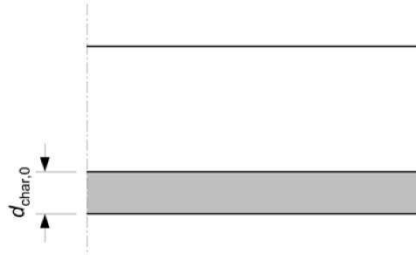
One-dimensional charring of wide cross section (fire exposure on one side)
